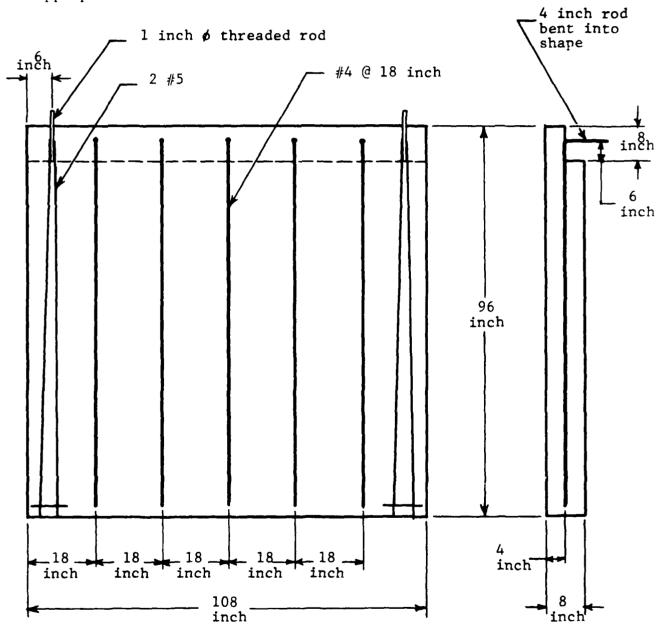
Typical 11-Story R/C Building Wall Panel Design
